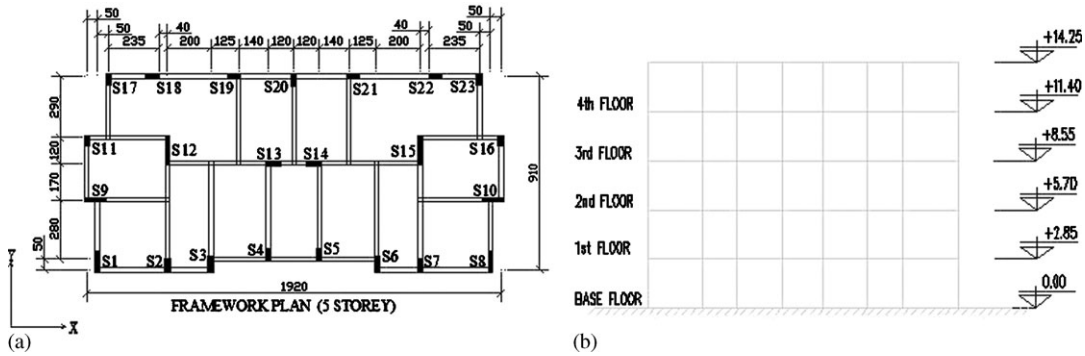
Five-storey building: (a) plan view (cm) and (b) lateral view (m).
